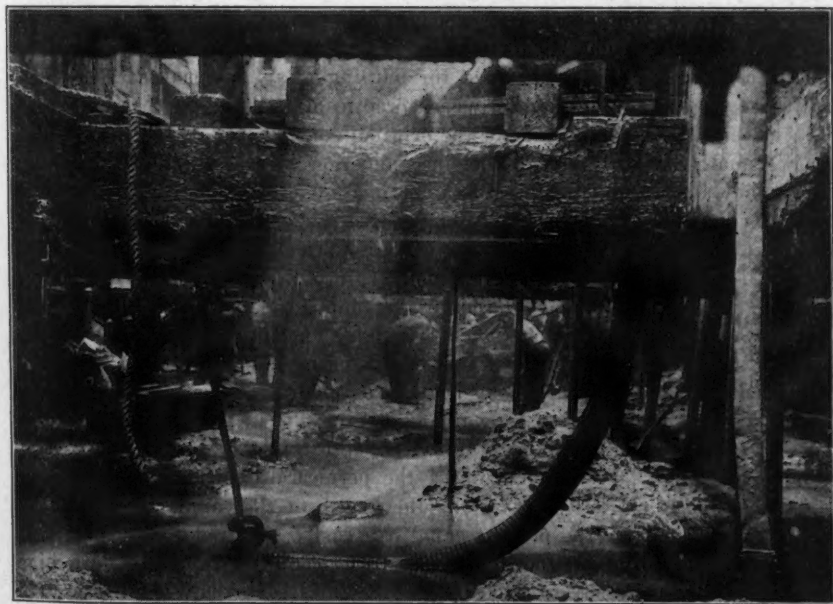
COFFER-DAM UNWATERED, NORTH MAIN PIER OF NEW RAILROAD BRIDGE.
